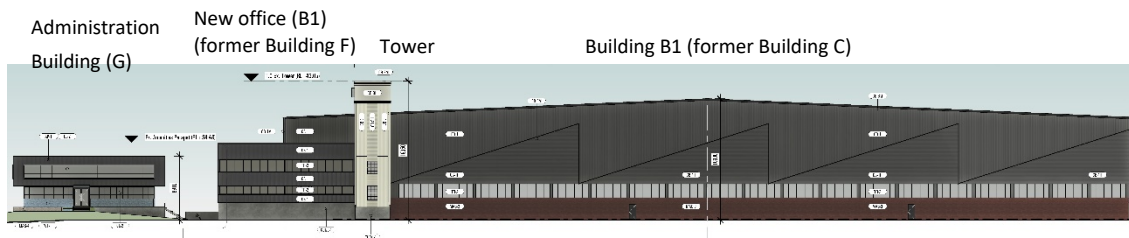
Proposed north elevation of existing administration building, new office, tower and Building B1
